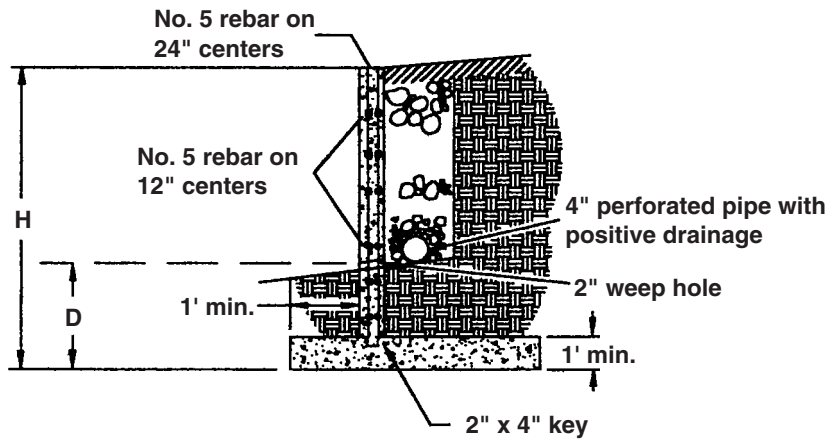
Cantilevered reinforced-concrete retaining wall detail.
